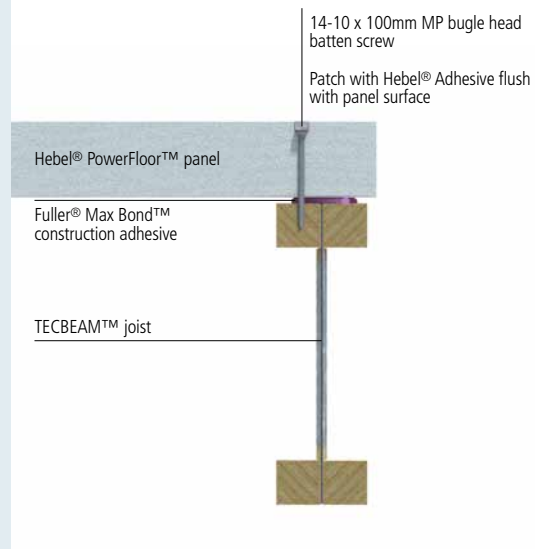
Fixing to TECBEAM™ joists at change in joist orientation
